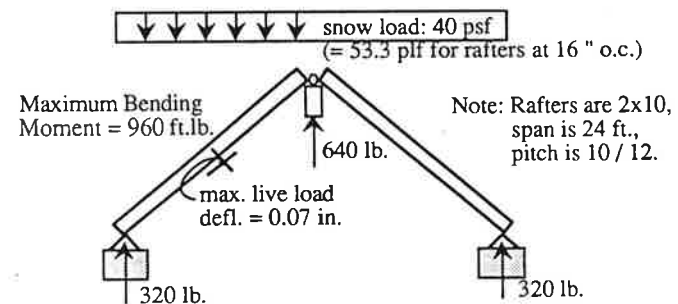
Two rafters, configuration 3, supported vertically at top of wall and by a ridge beam.
